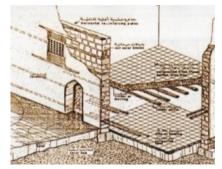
Residential buildings in the dry hot area, such as Madinah houses, contain an internal courtyard [12]
